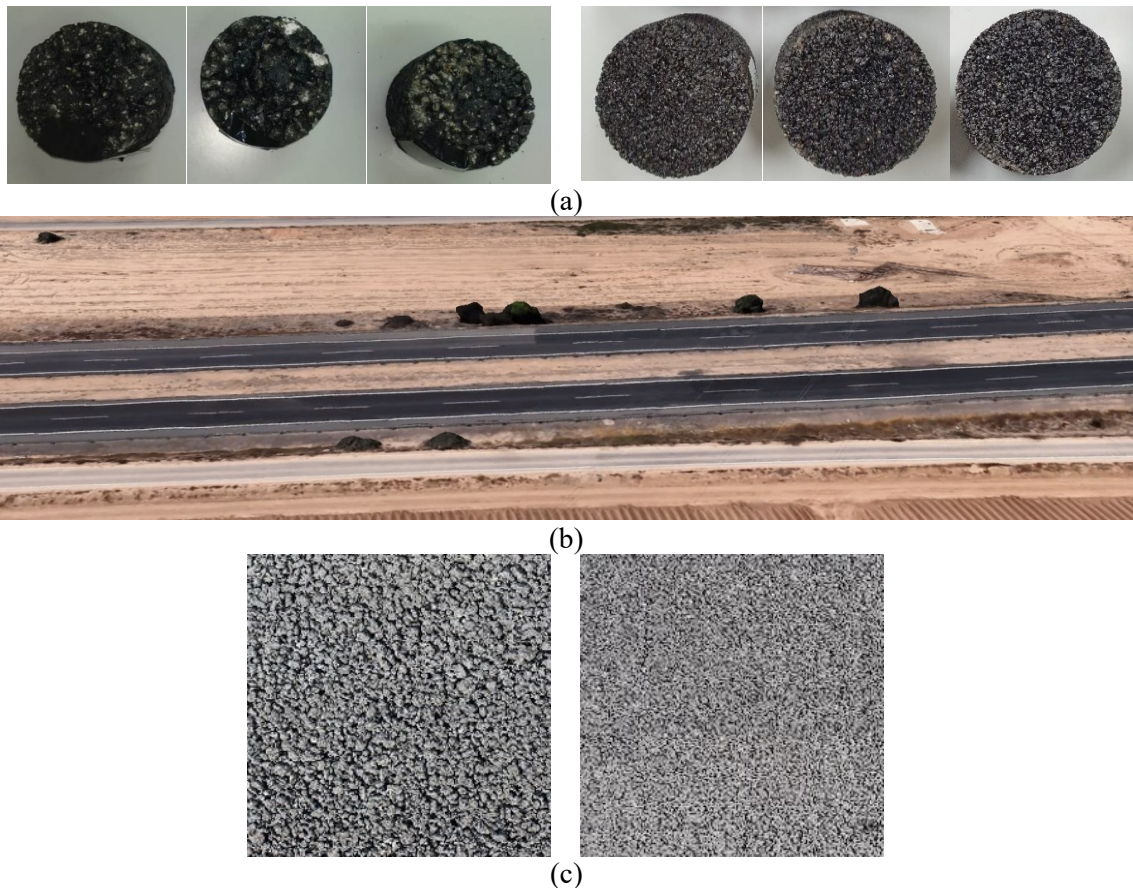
Asphalt mixtures under test: (a) laboratory cylindrical specimens: BBTM-11B (left) and PA-6 (right); (b) test tracks (upper road): BBTM-11B (right lane) and PA-6 (left lane); and (c) detailed view of the test tracks: BBTM-11B (left) and PA-6 (right).
